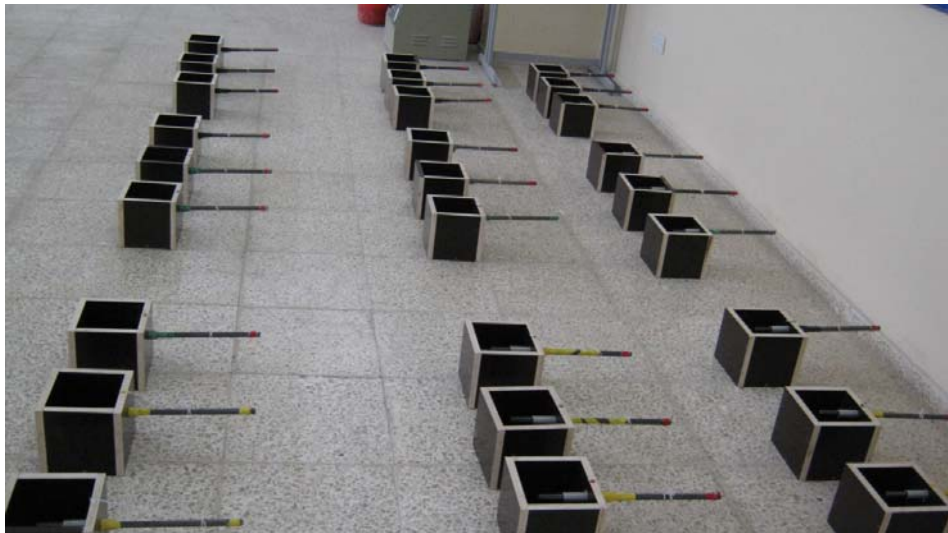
Set up of first group ($w/c= 0.40$) of 27 specimens before casting concrete.
